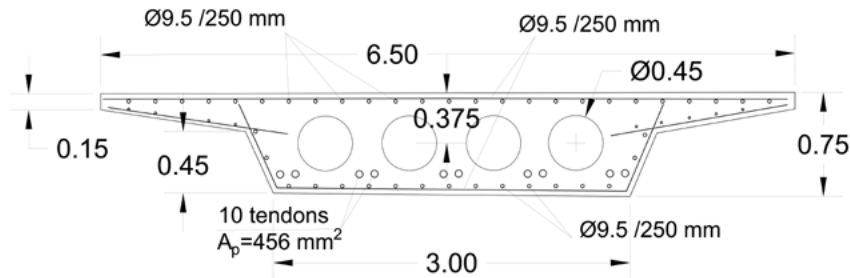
Cross-section and reinforcement at the bridge mid-span.
